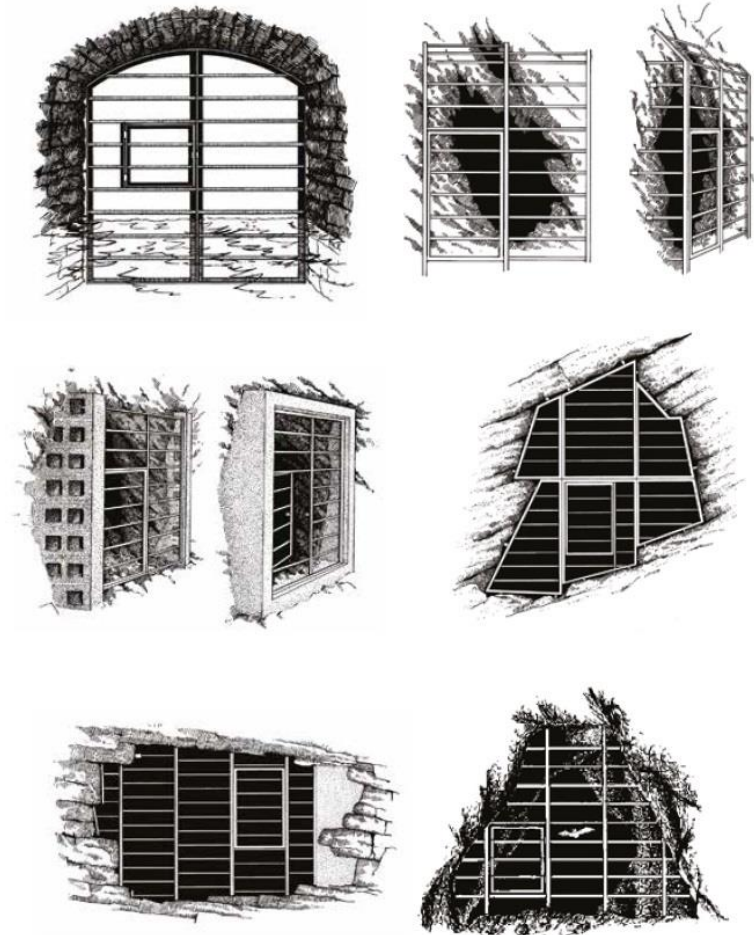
Examples of grilles fitted to horizontal entrances. Grilles can be made oversized and pinned to the rock face, fitted inside the entrance using bolts or pins or built into blockwork to square up and stabilise the entrance. Large grilles can be constructed off-site in sections and bolted or welded on site. A lockable entrance door should always be fitted.
